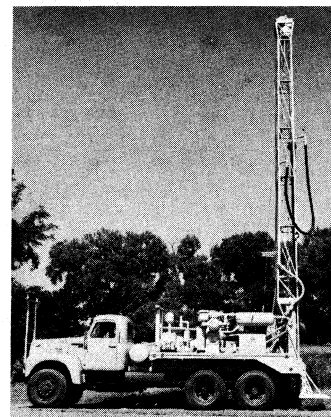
STRAIGHT ROTARY RIG WITH MAST IN WORKING POSITION
